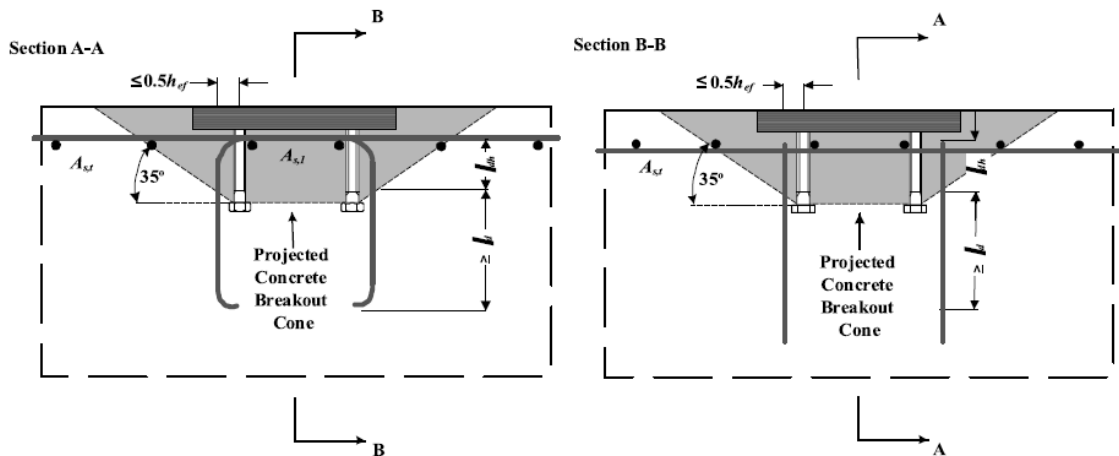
13 Anchor reinforcement presented as hairpins. Modified from ACI 318 , 2014
